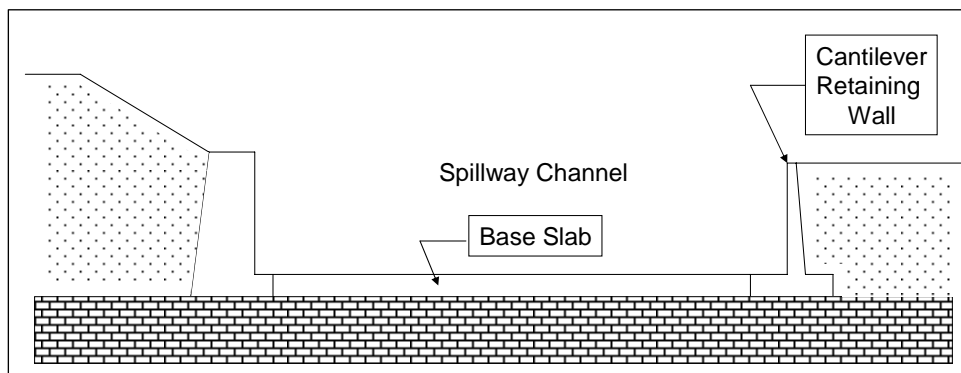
Rock-founded cantilever retaining wall bordering a spillway channel.
